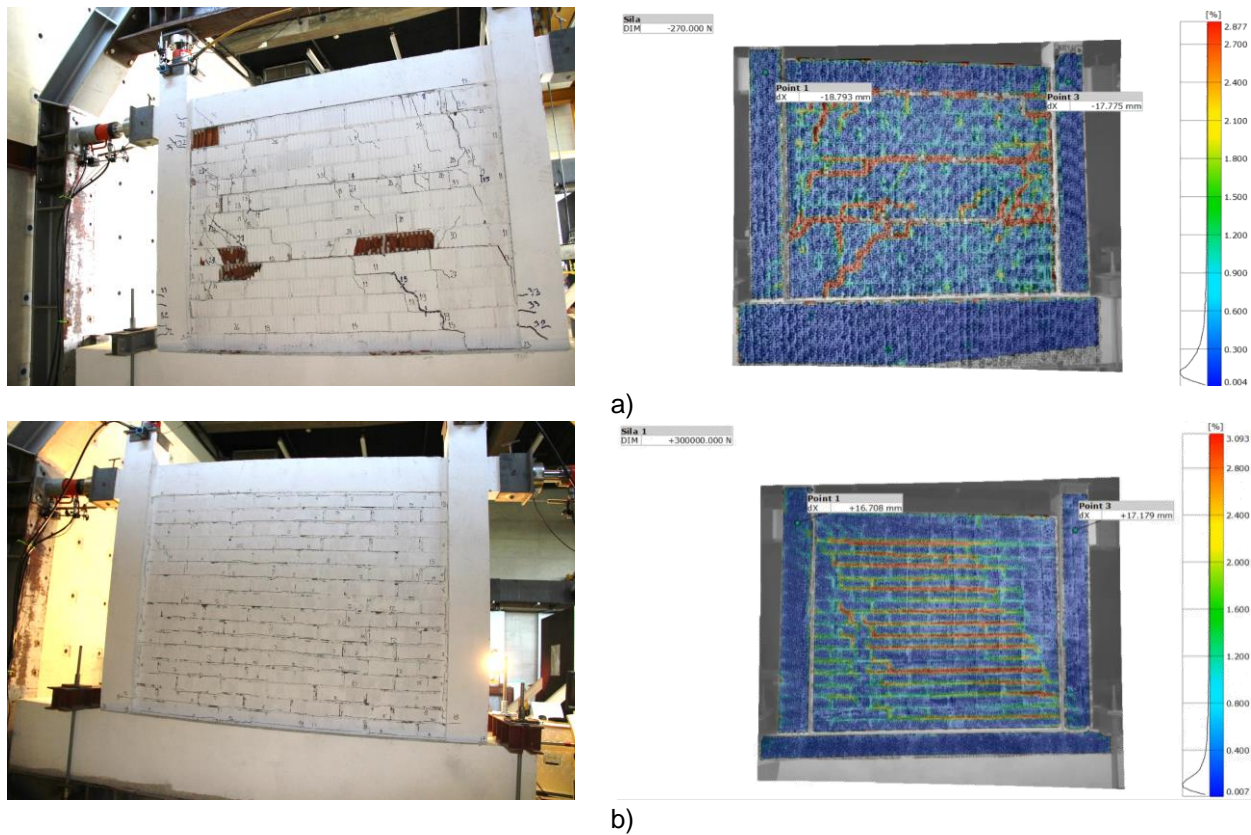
Damage state at final stage of IP tests on test RC frame with masonry infill walls presented photograph (left) by Von Mises strains recorded by ARAMIS (right): a) clay block, and b) clay brick masonry infill wall with tie anchors
